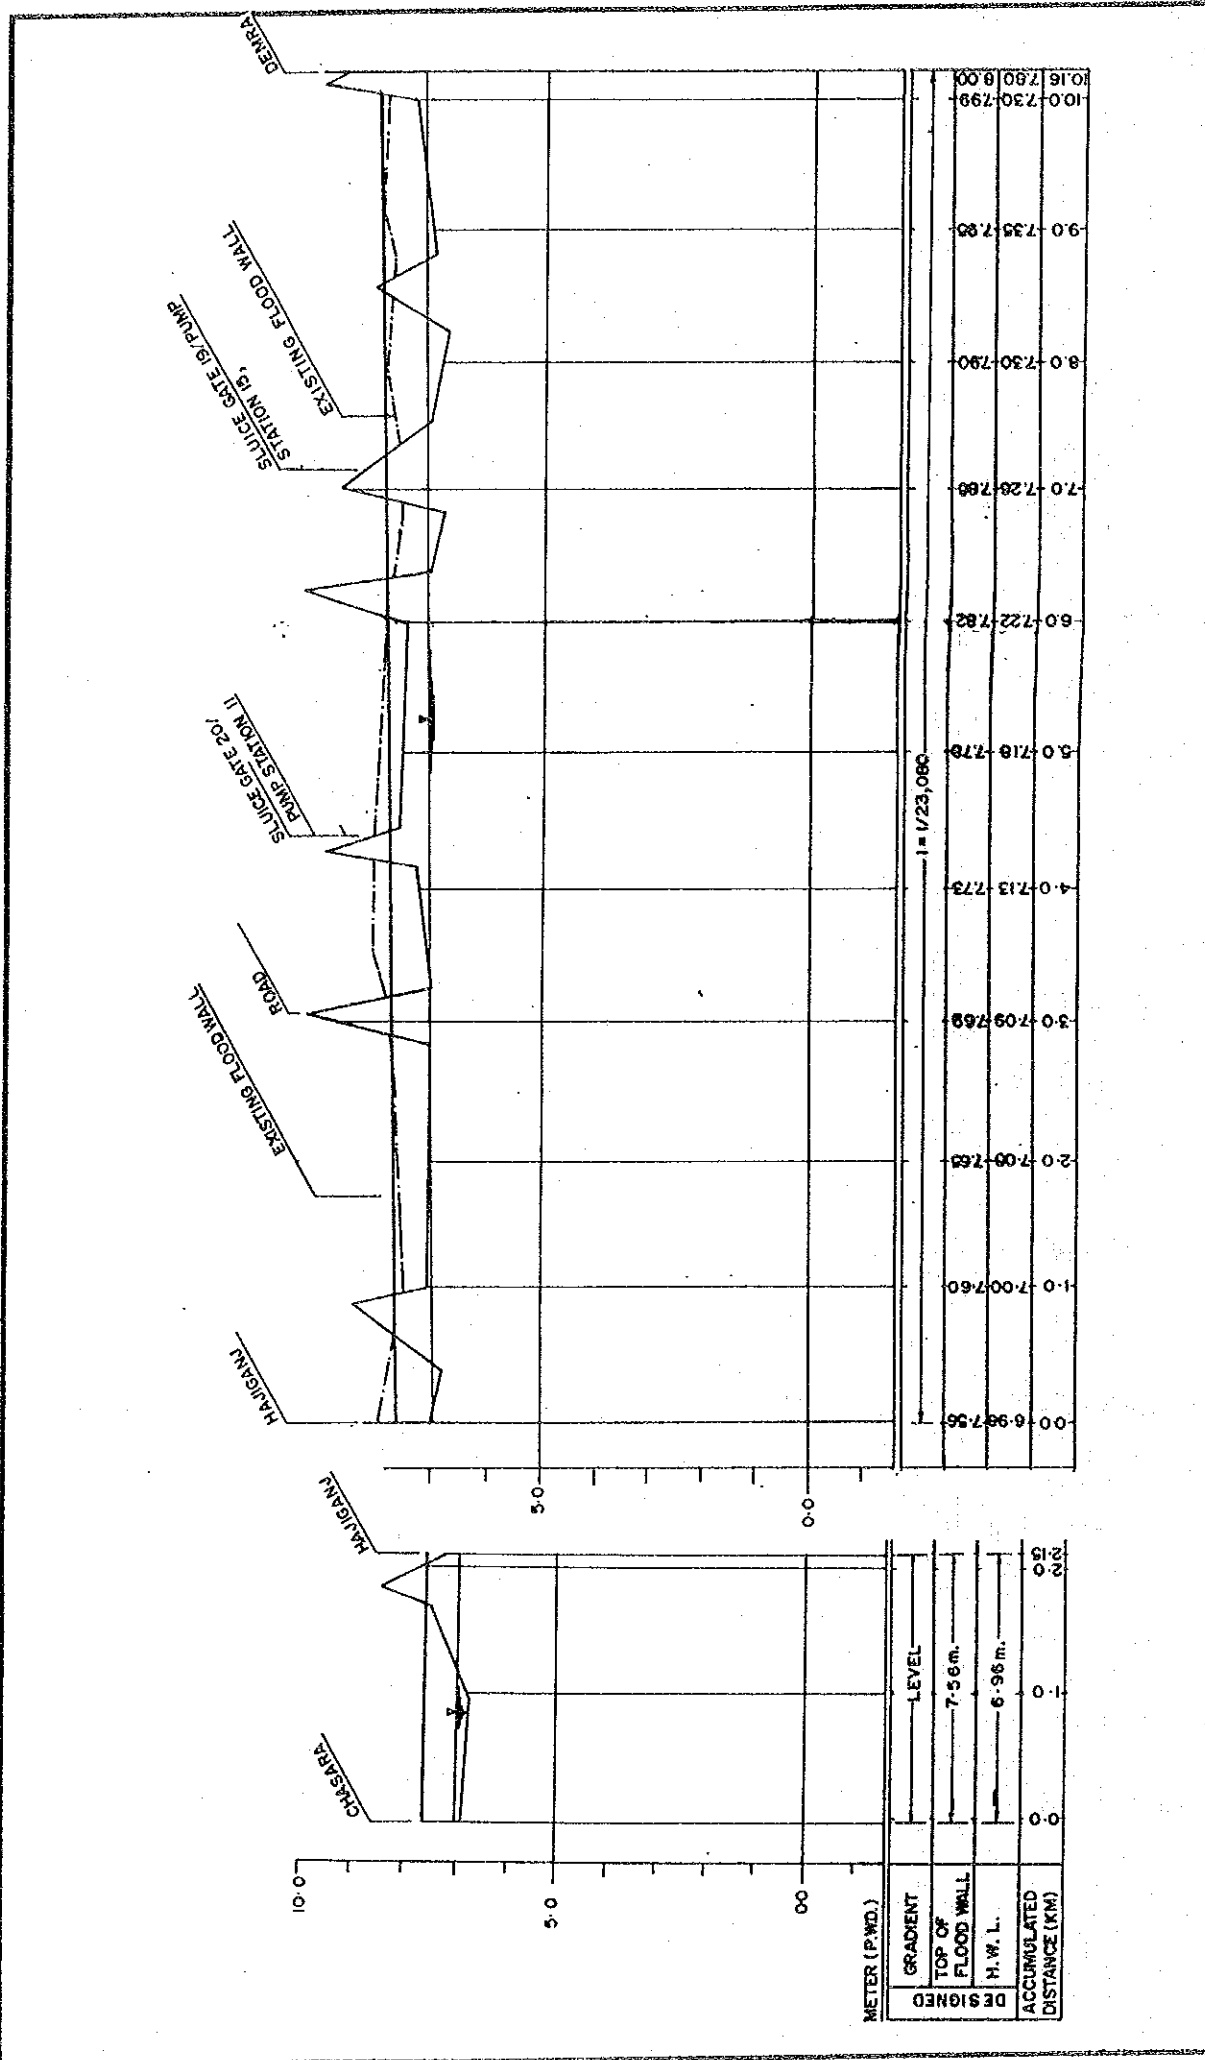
(3) LONGITUDINAL SECTION OF FLOOD WALL : DND (DS AND DE)
